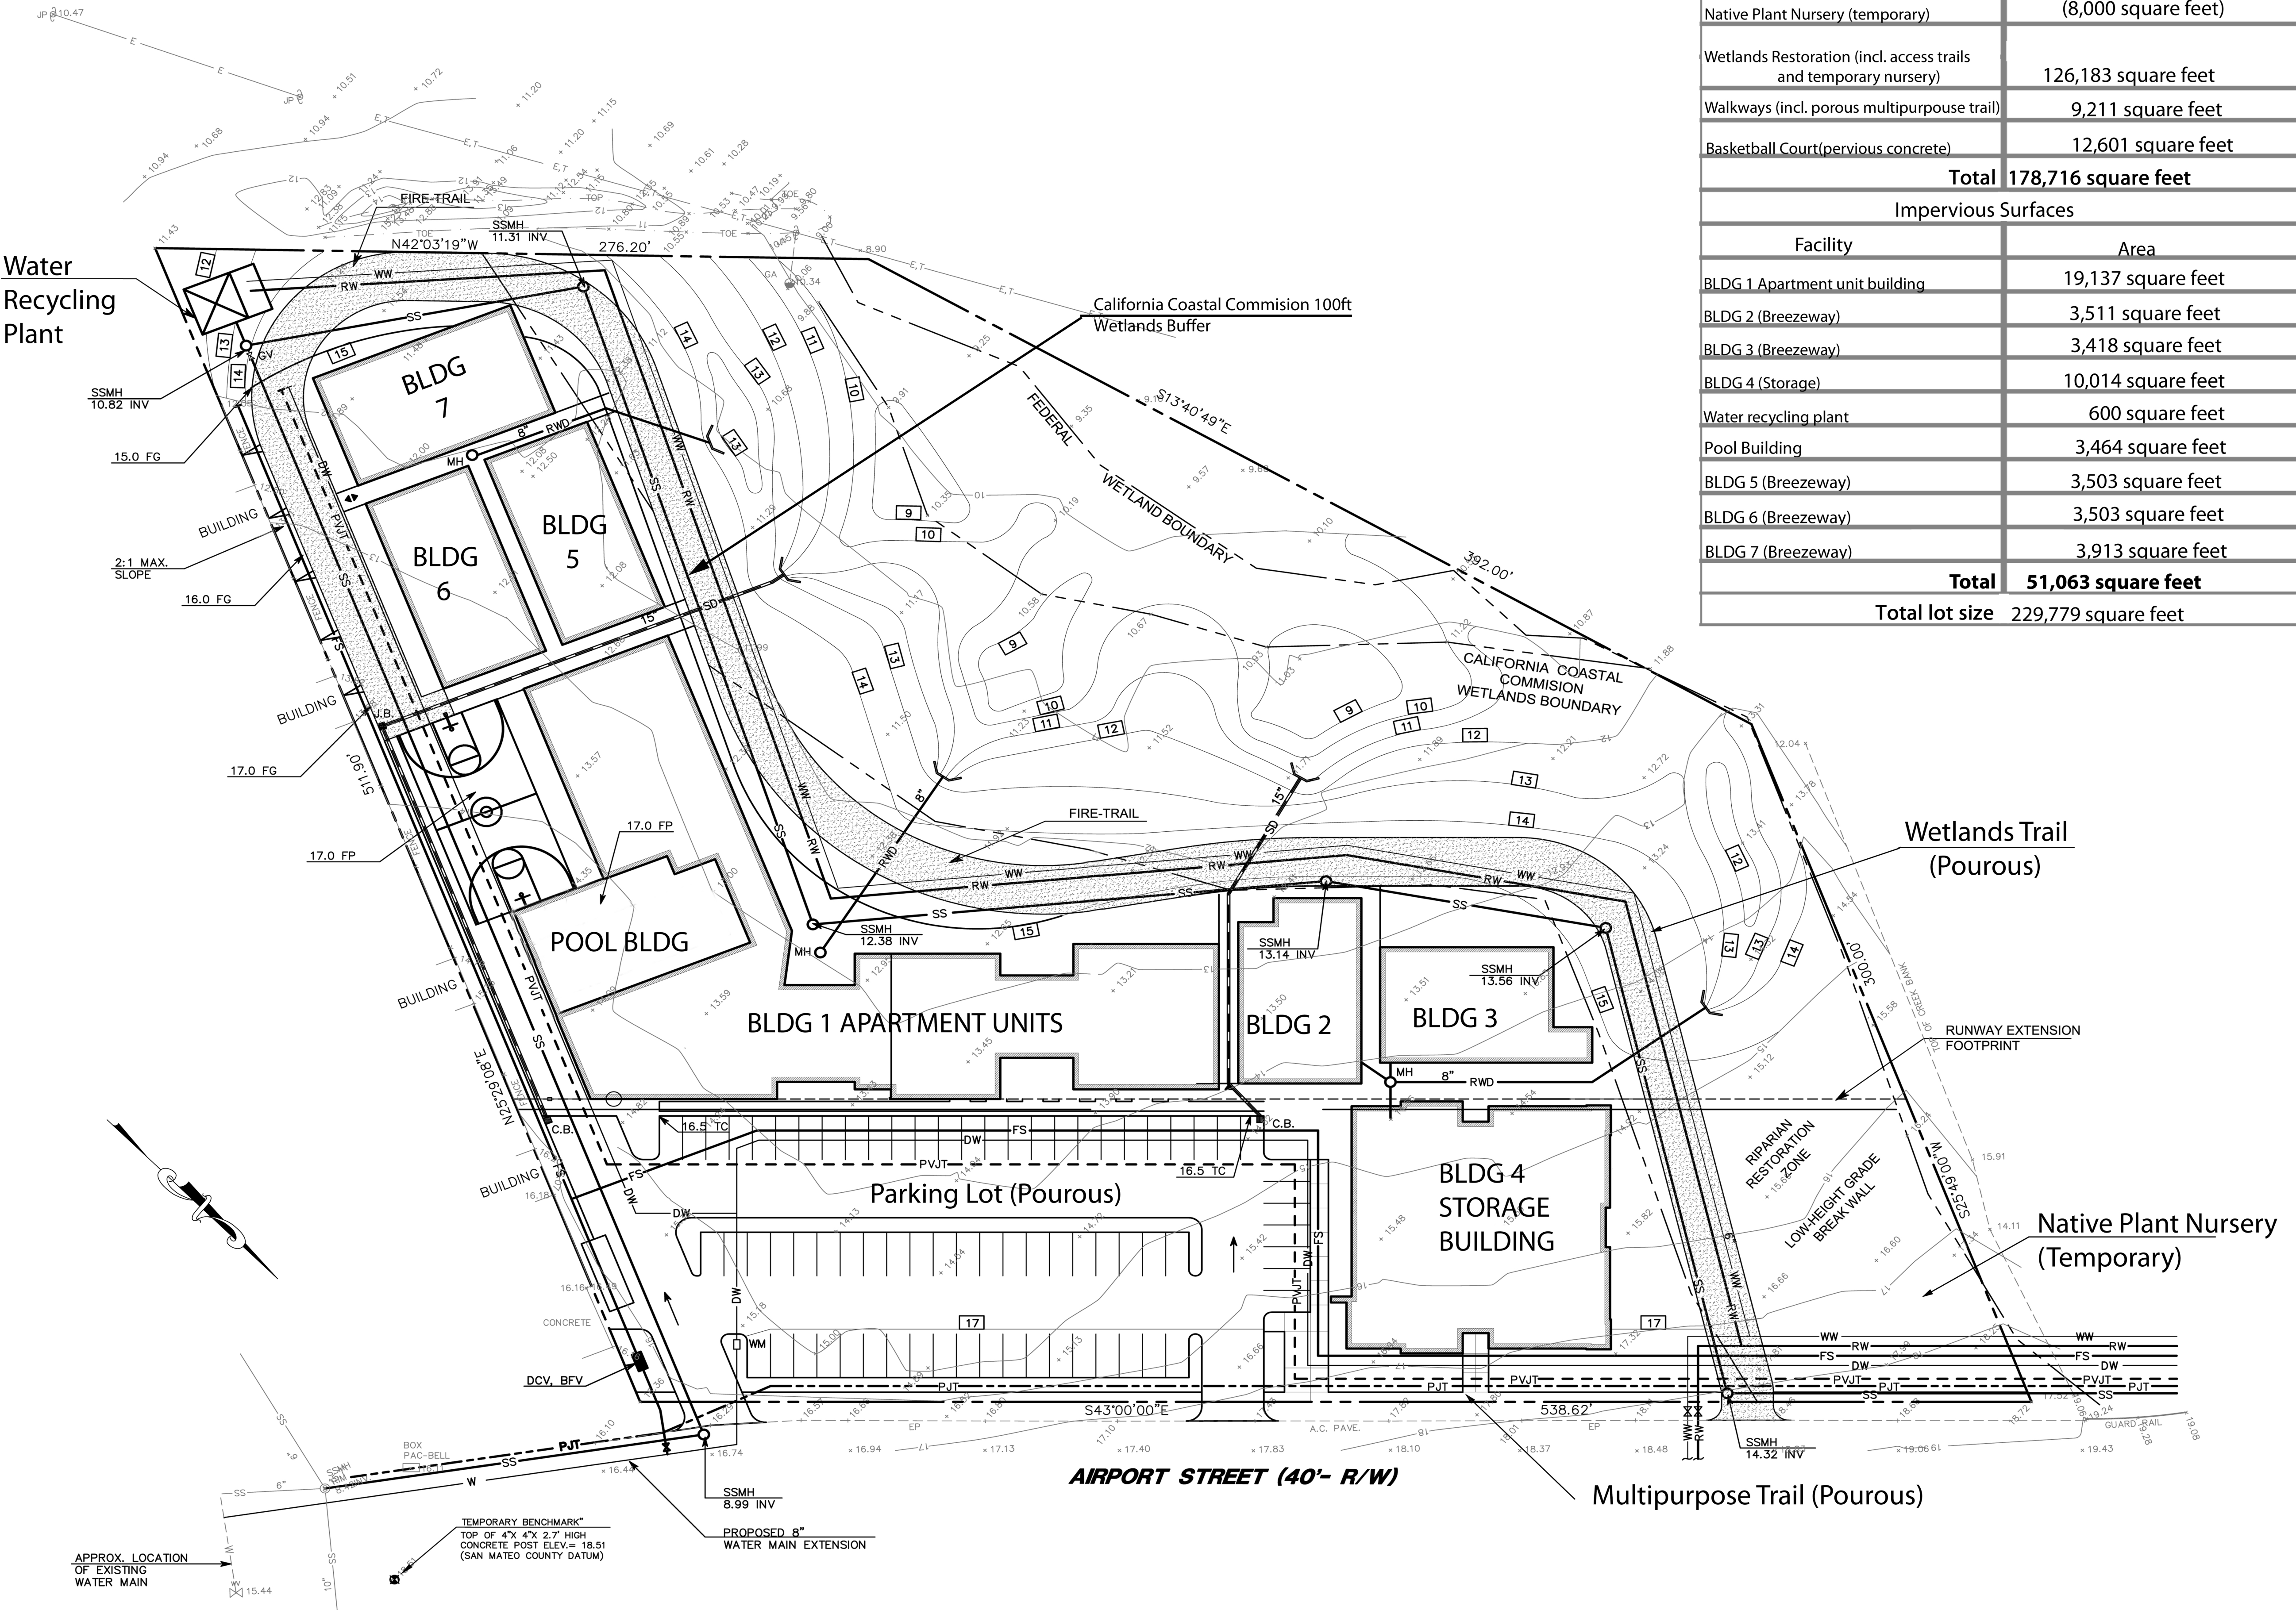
WELLNESS CENTER SITE PLAN
